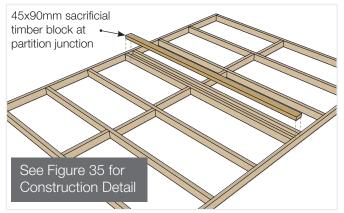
SACRIFICIAL TIMBER AT WALL JUNCTIONS
